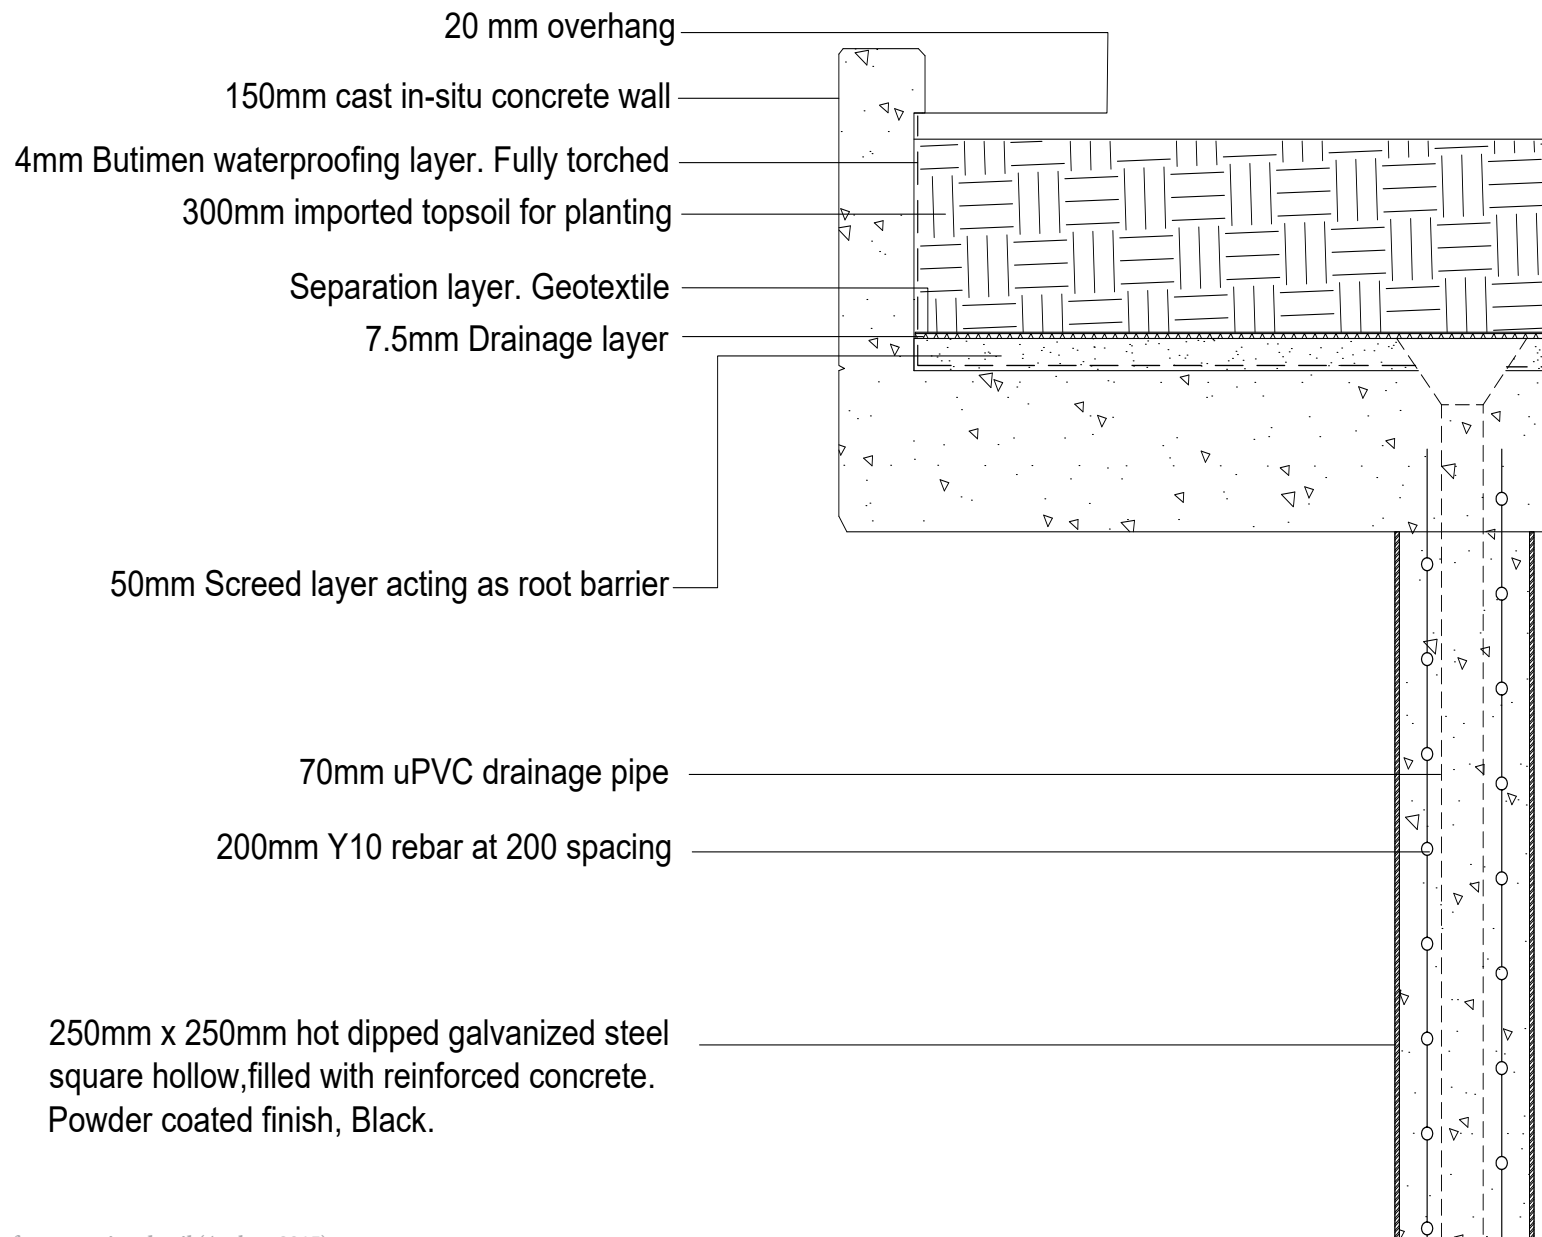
Green Roof construction detail (Author, 2015)
